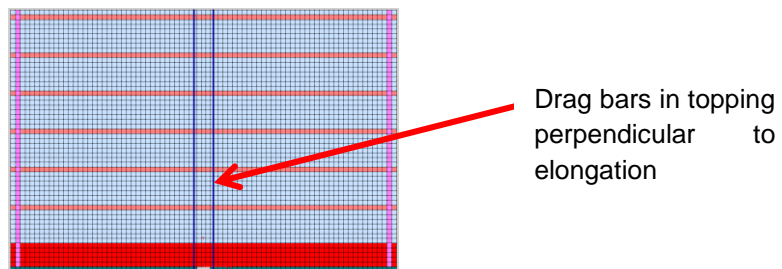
Typical floor model layout with drag bars in topping (arrangement 3 shown)
